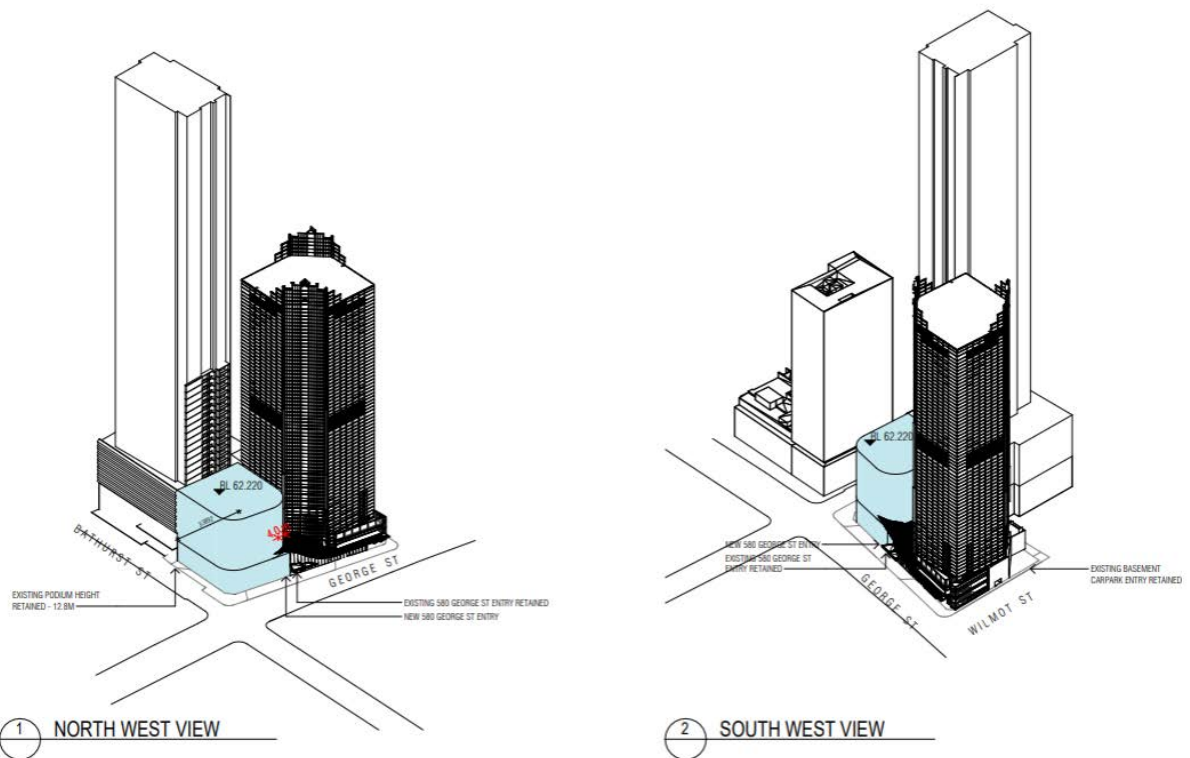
Extract of proposed plans showing Block of Ice Plan.
